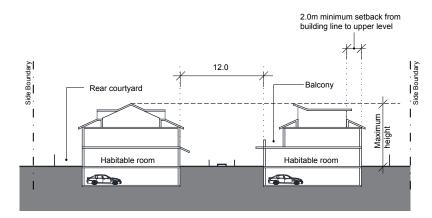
A.4-1: Minimum building separation controls for multi-dwelling housing development up to 3 storeys.
